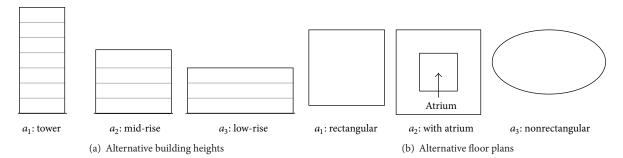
Alternative shapes and floor plans of a building specified on the conceptual level of design process.
